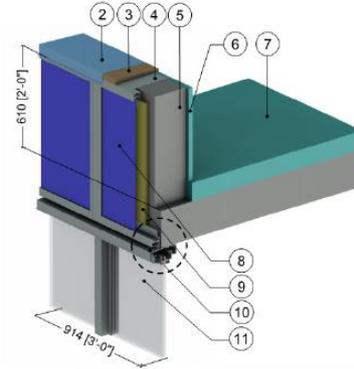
Window Wall System – Inside Corner with Spandrel to Vision Transition & Interior Spray Foam Insulation
